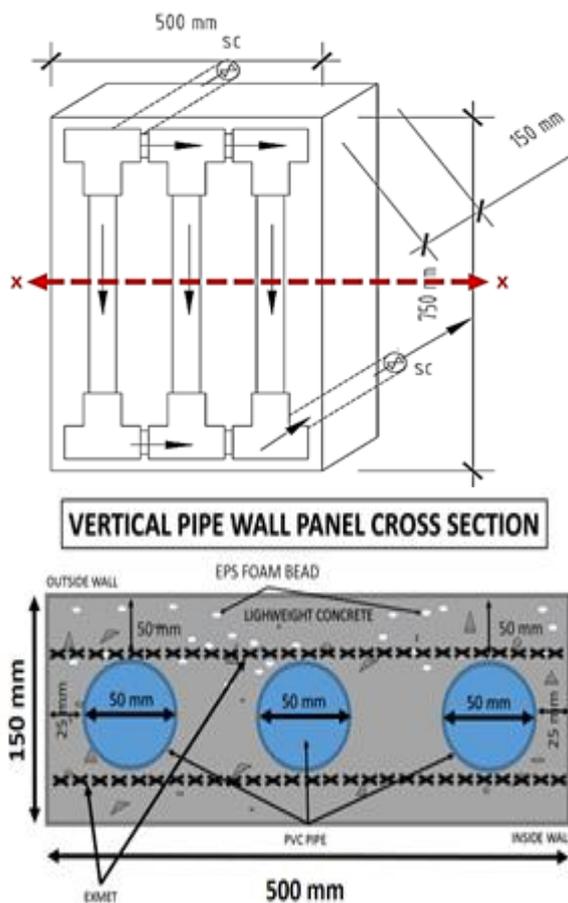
The details of the pipes position in the Heat Resistance Wall Panel (HRWP) lab sample
